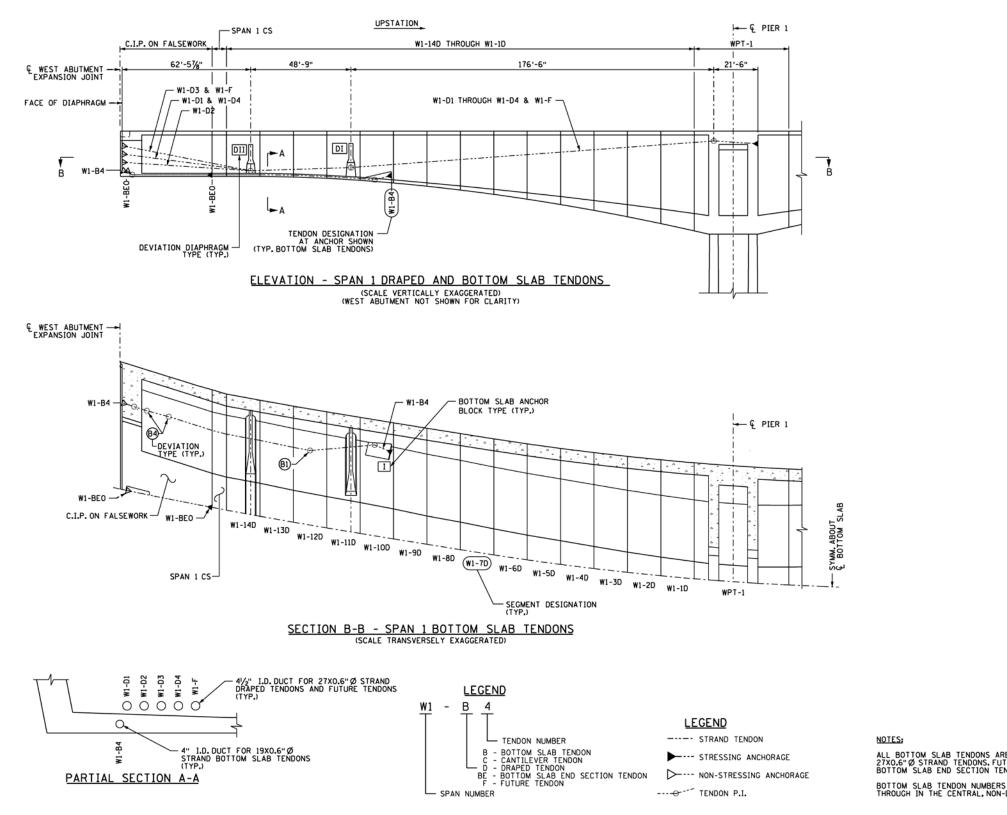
Westbound Span 1 Draped and Bottom Slab Post-Tensioning Layout
